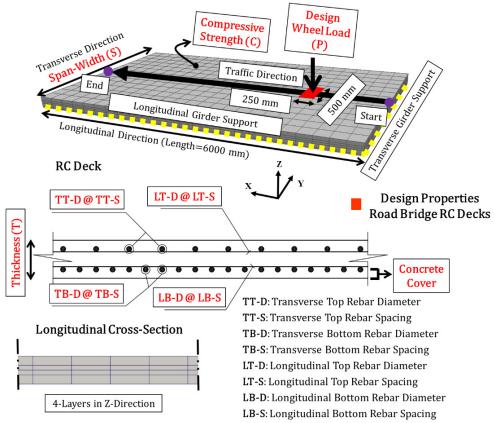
Design properties of RC decks of road steel-girder bridges.
